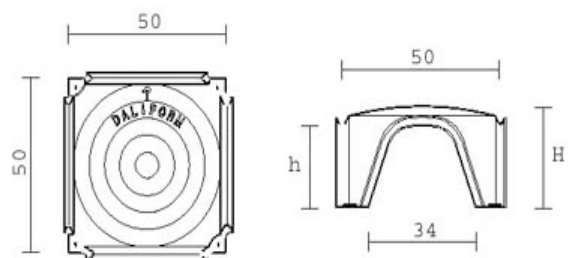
Iglu® Modular Formwork System (Daliform srl.)
